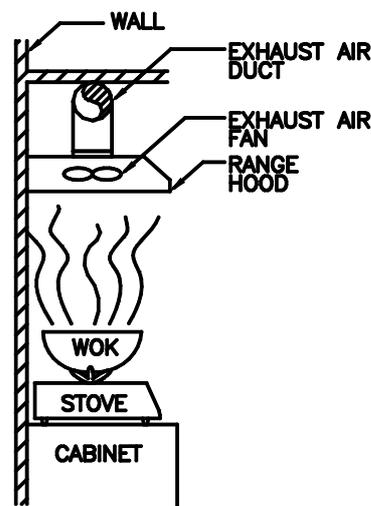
Typical installation configuration of a domestic kitchen exhaust hood
